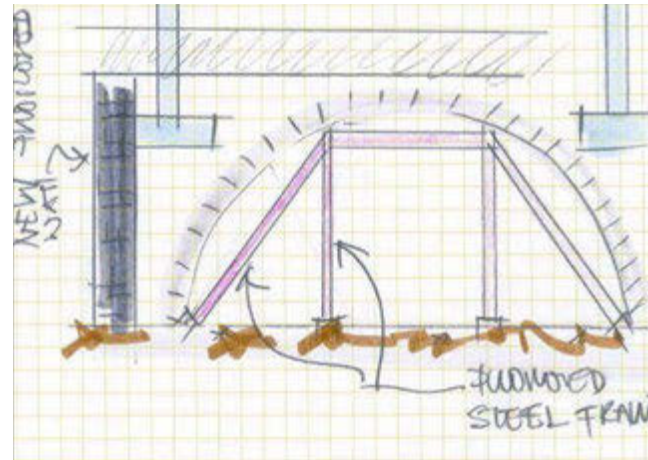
Sketch of proposed temporary support in adjacent arch
